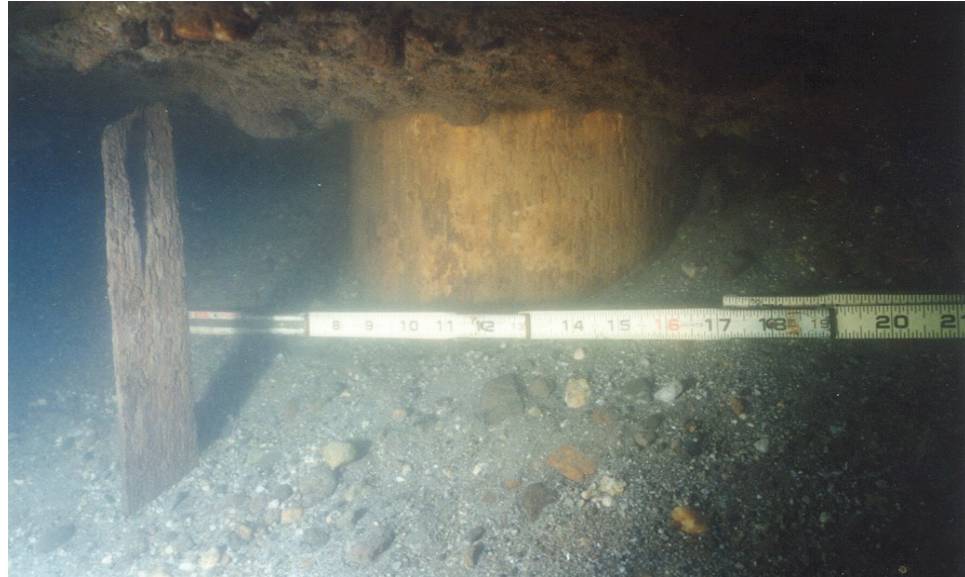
Pier Undermining, Exposing Timber Foundation Pile
